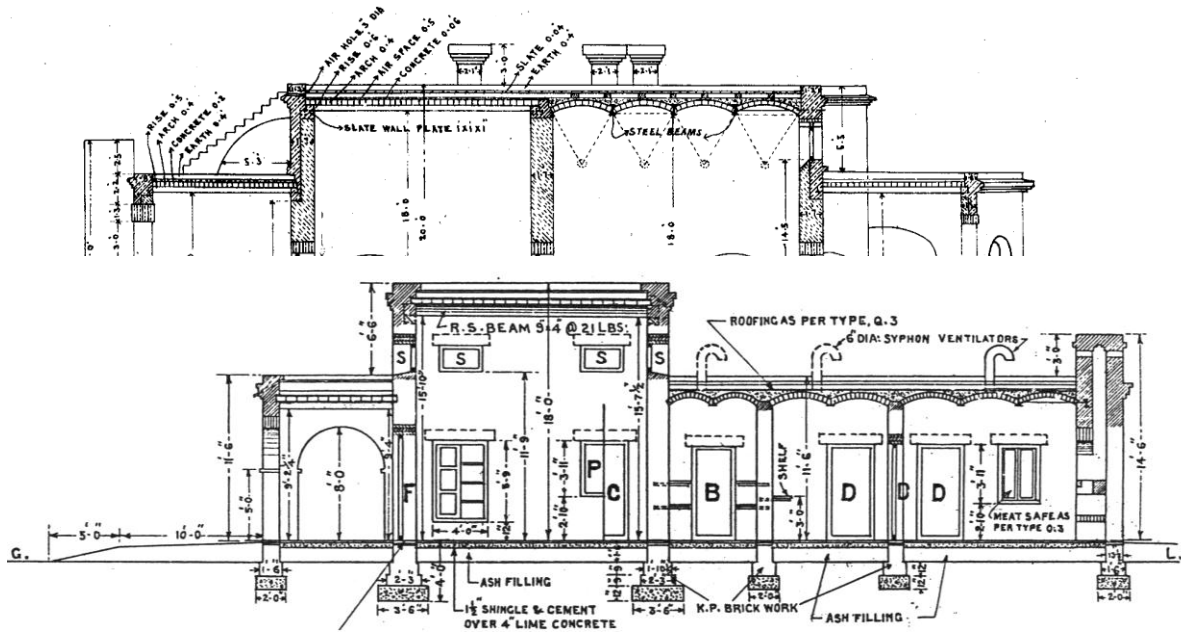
Sectional Detail of a bungalow of British Officer of Irrigation Department showing Jack Arched Roofing, Amritsar, India, 1908.
